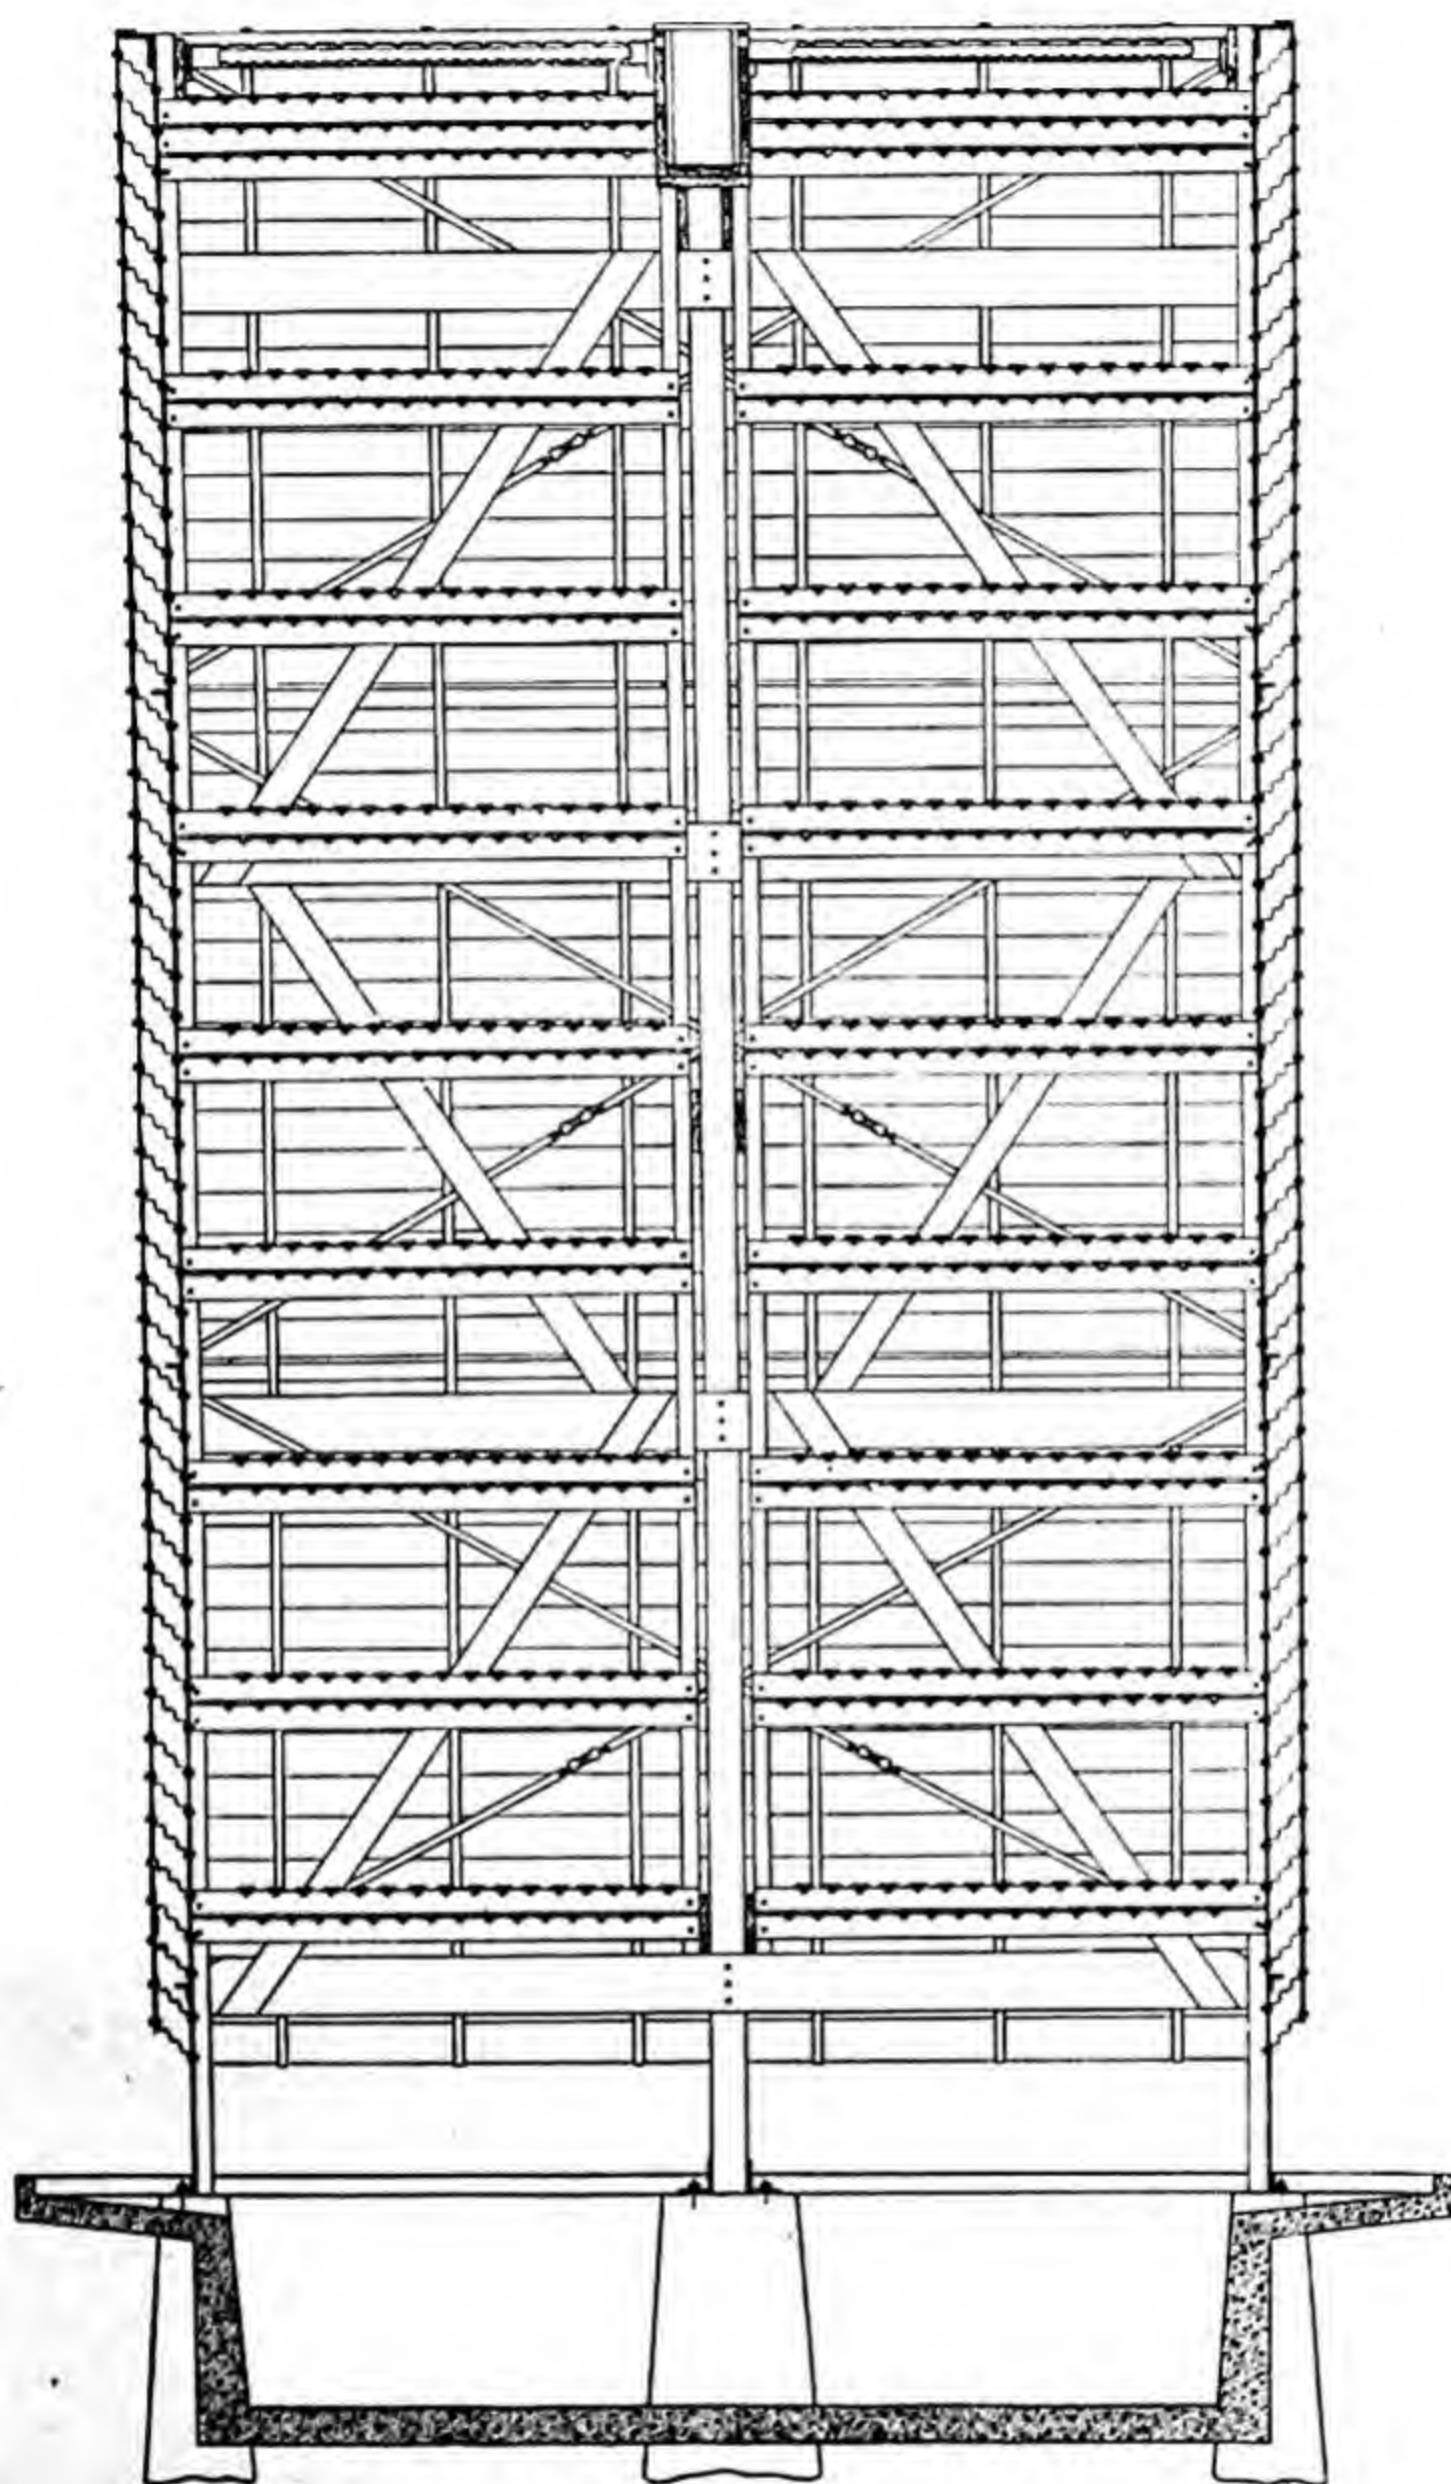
Cross-Section Showing Half Section of Cooling Tower Co. Towers.
